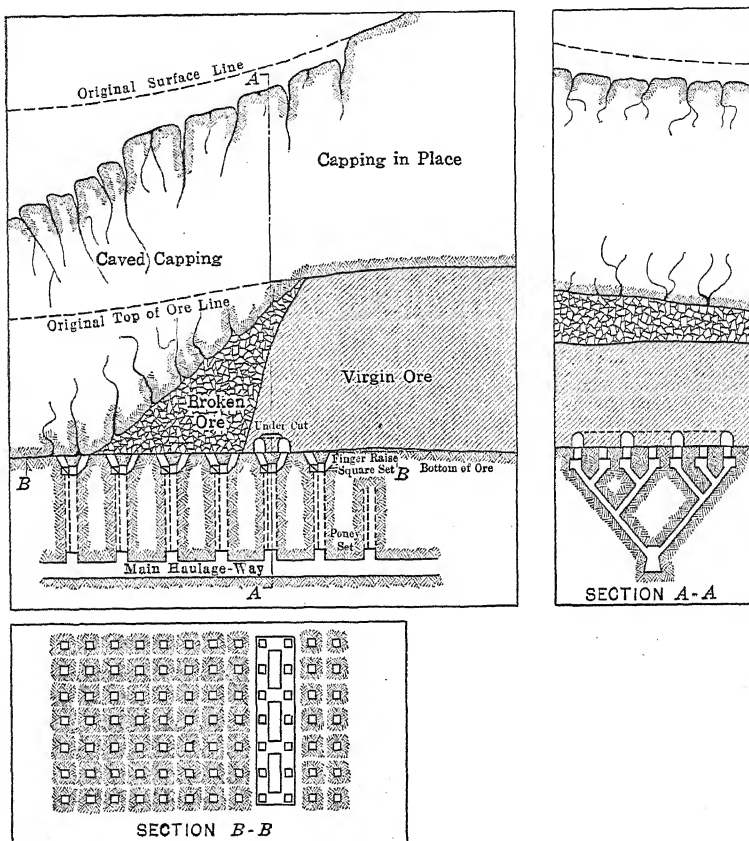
BRANCH RAISE CAVING SYSTEM.
